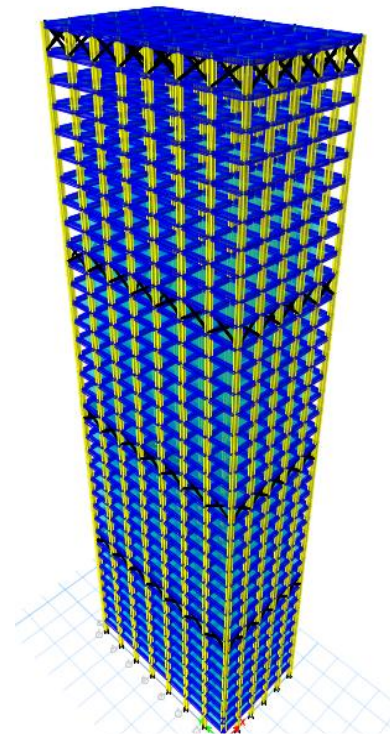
Perspective view of a storey showing outrigger (steel) and Brace core wall (Model 6)
